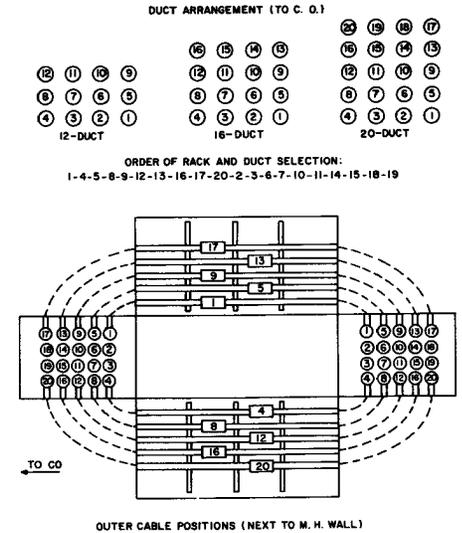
Type A Manhole—6-Foot Wide—20-Duct Capacity—4-Wide Configuration
